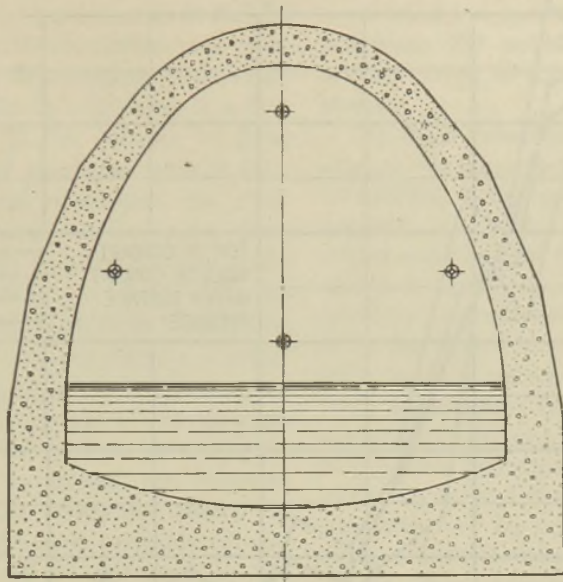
Cross section of 9 ft. 6 in. sewer showing location of sampling points.
